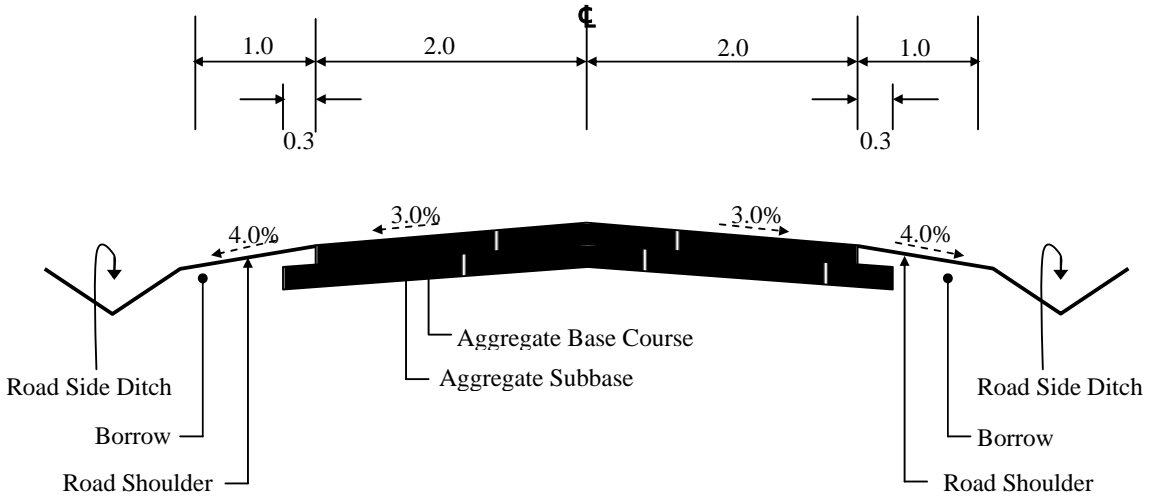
Typical Cross-Section of Two-Lane Gravel Road
